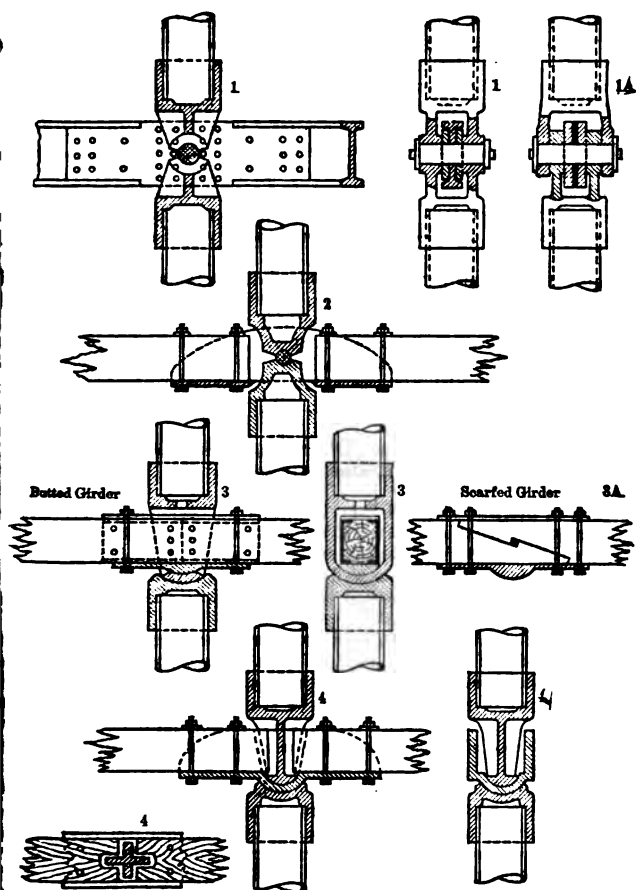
Connections, Caps and Bases for Steel-pipe Columns
